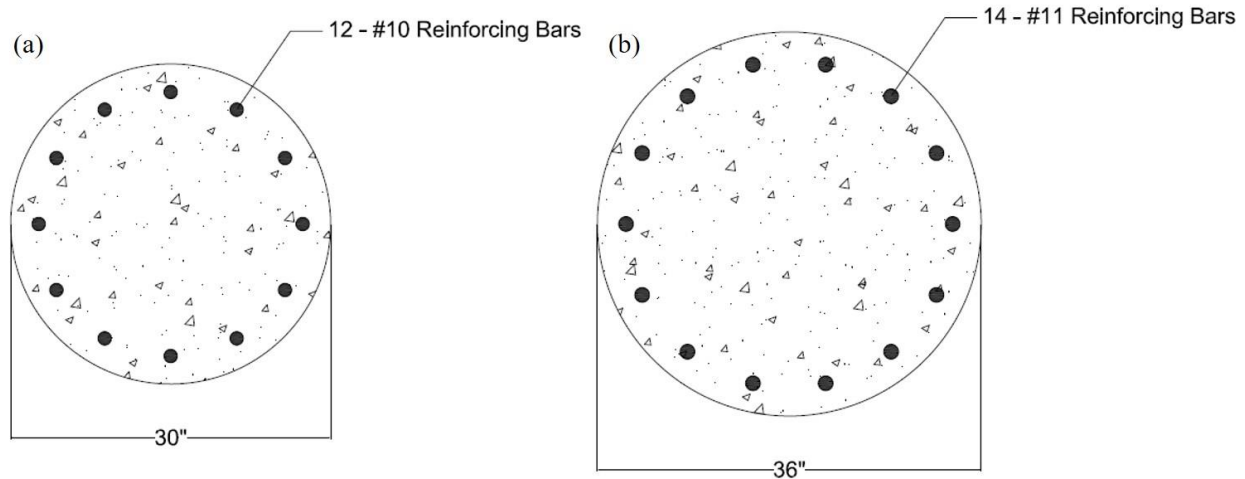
Cross-sections of the pier columns used in (a) the 15-ft clear height short piers, and (b) the 40-ft clear height tall piers.
